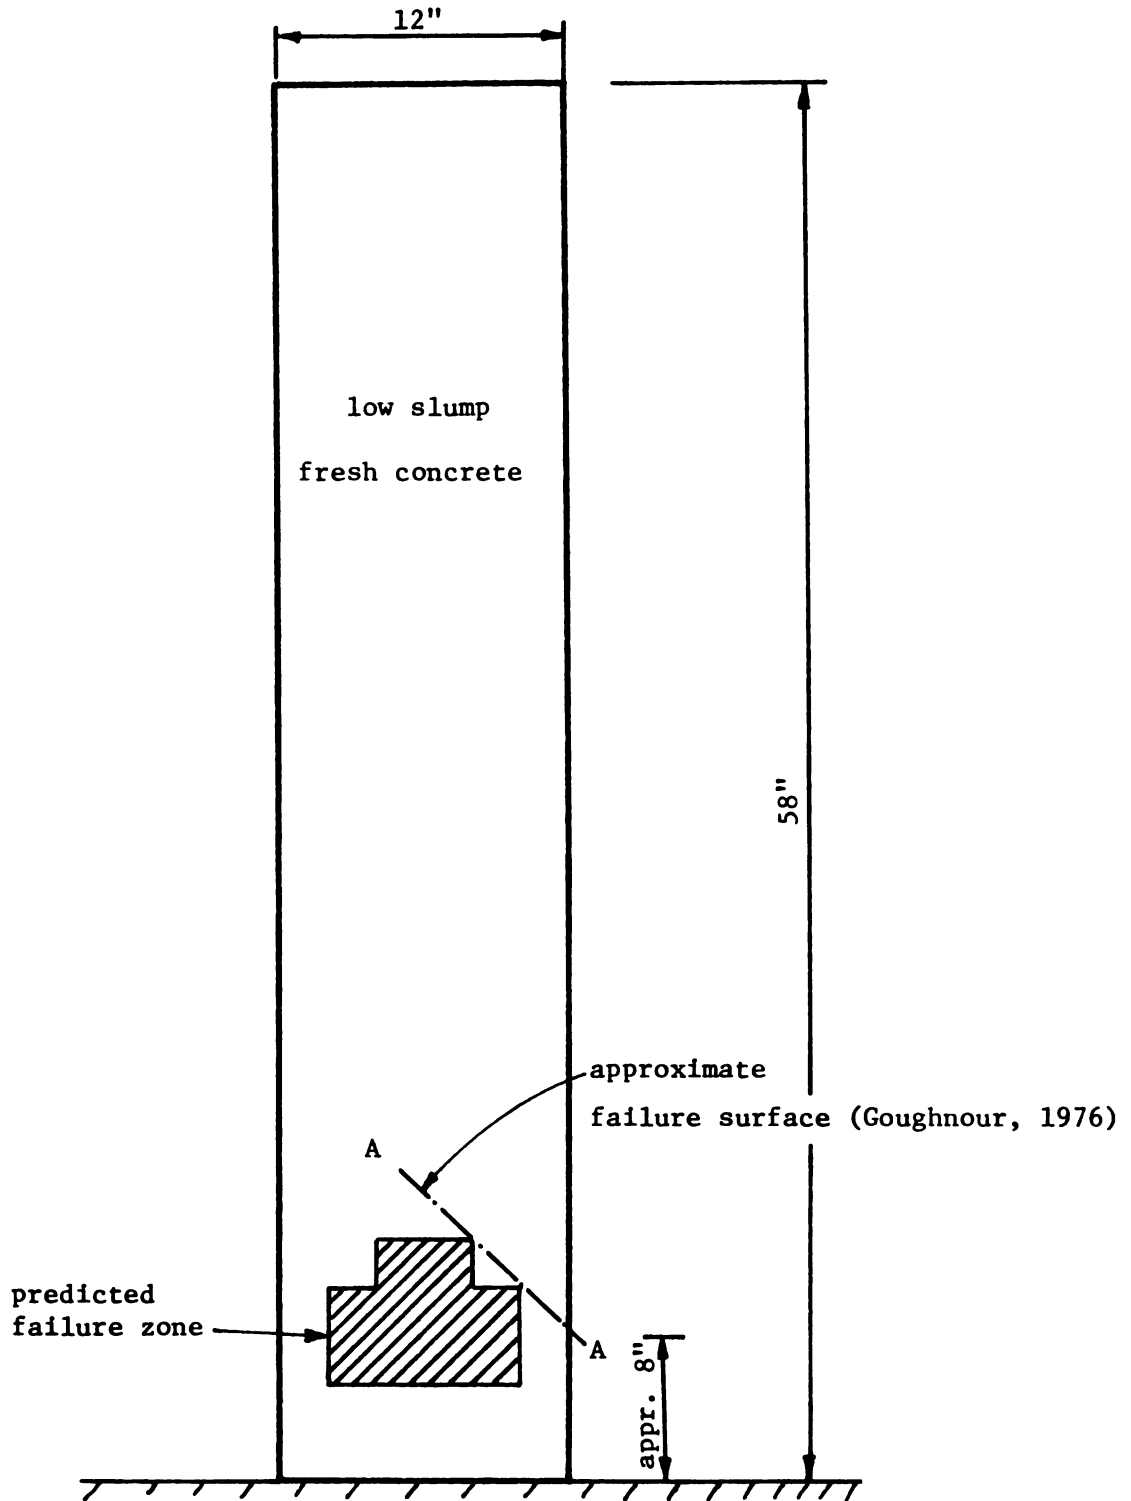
Development of a failure zone for the experimental slipformed wall section.
